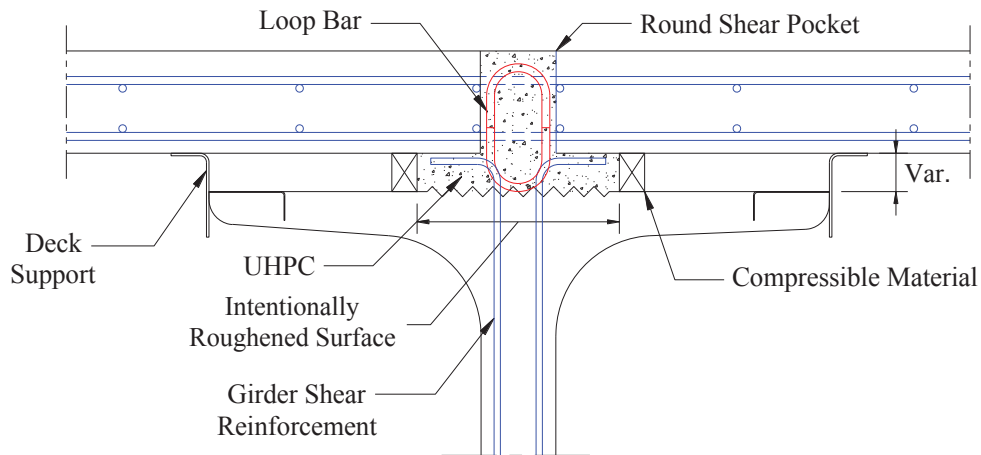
Proposed Precast Concrete Deck-To-Concrete Girder Connection
